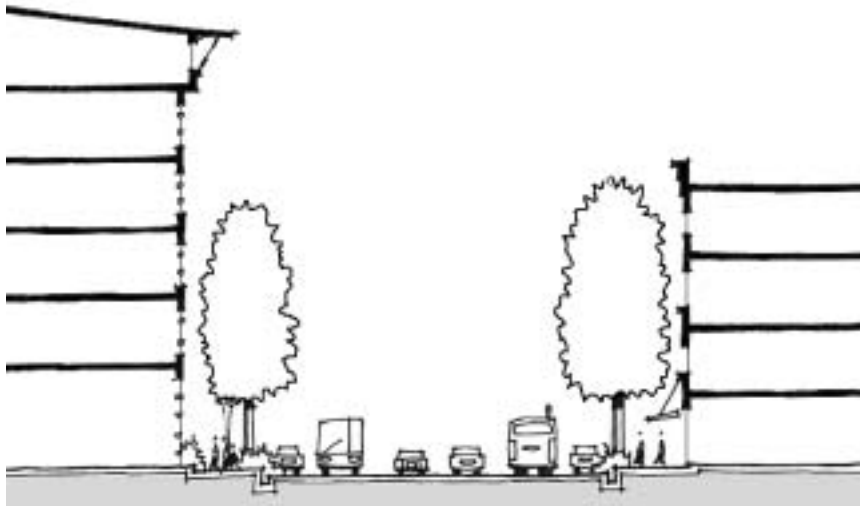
Autumn Street Section: 100' Right of Way. 2 travel lanes, 1 parking lane each way
